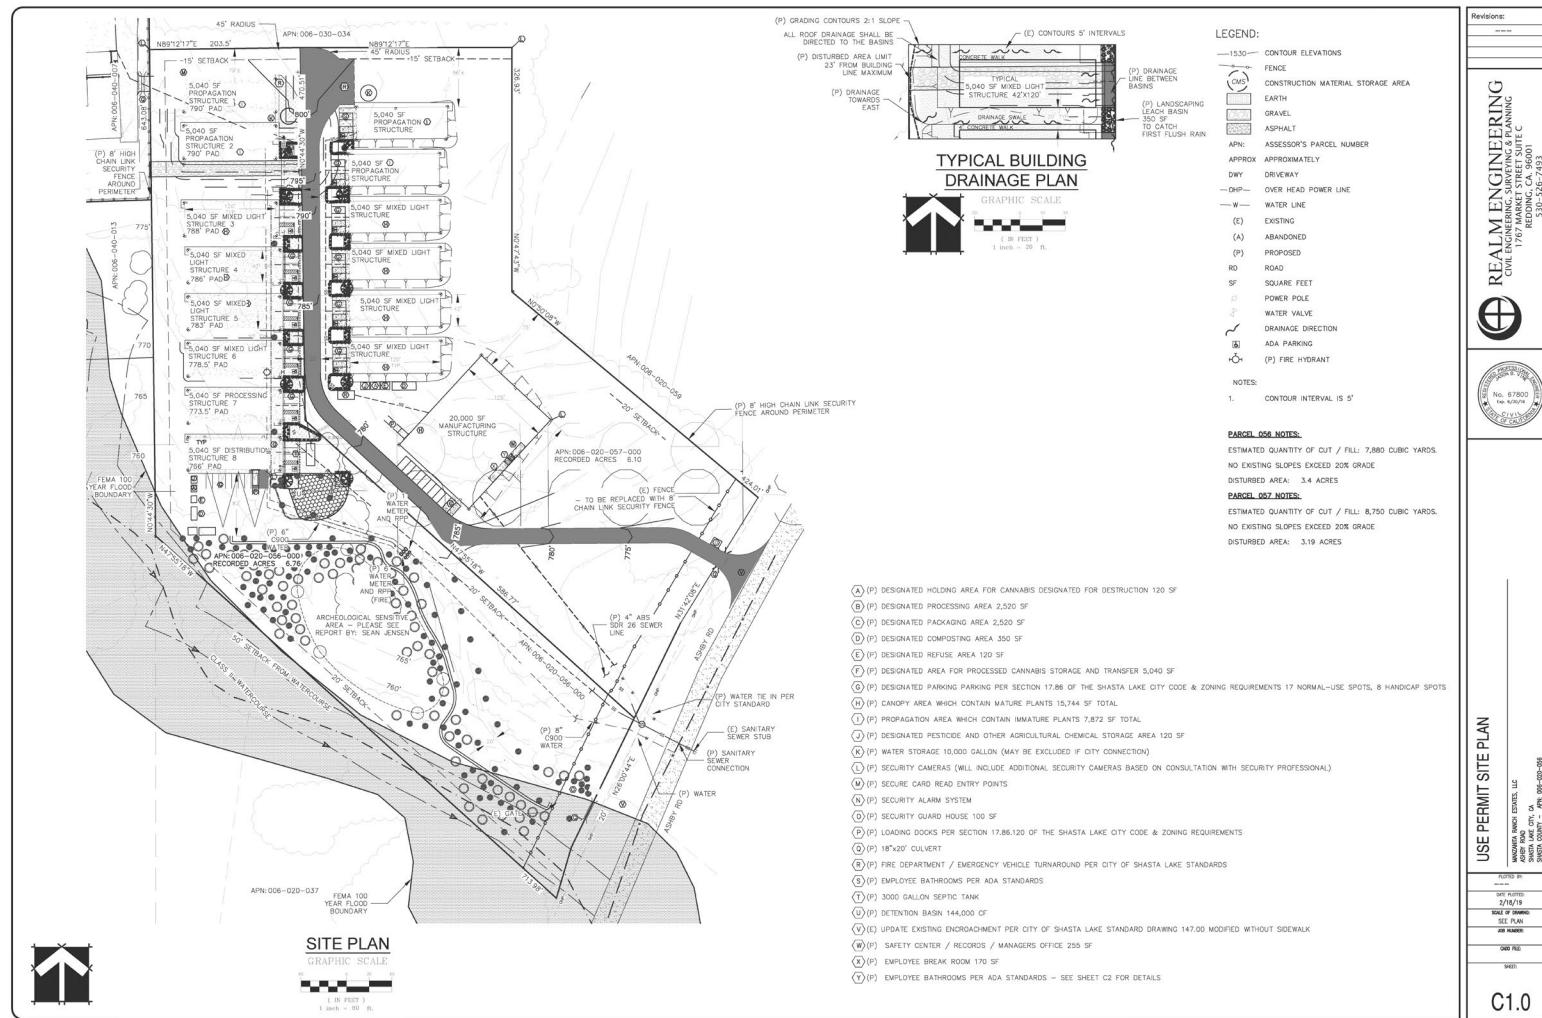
Preliminary Site Plan, Parcels 006-020-056 and 006-020-057
